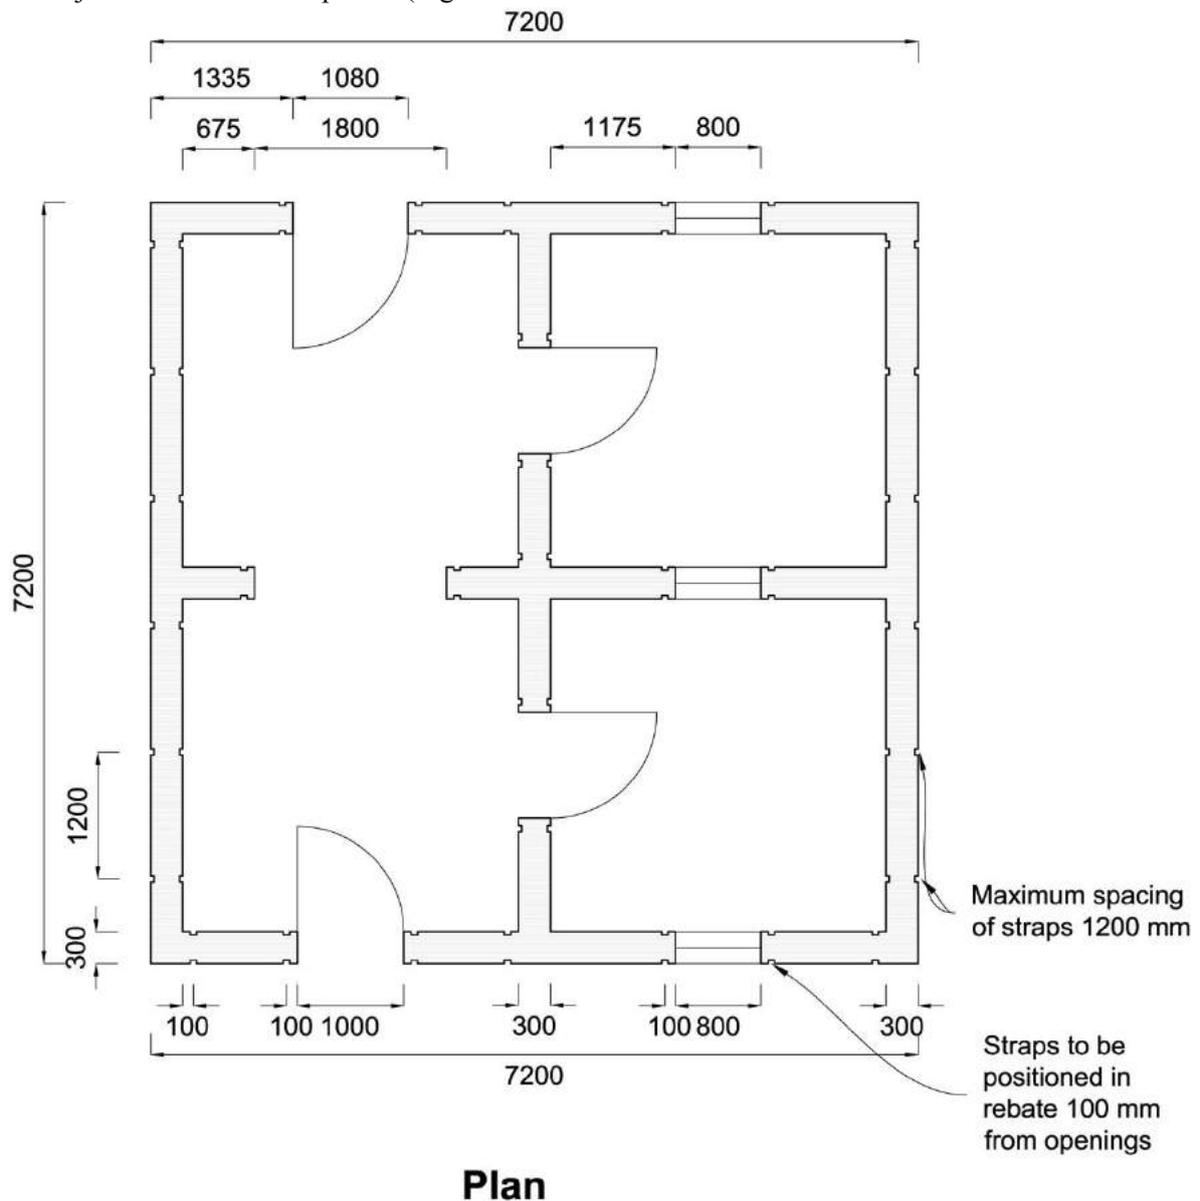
Plan sketch showing idealized locations of vertical rebates and straps. Off-sets (see Figure 3.3) allow for wrapping the straps over the rafters.
